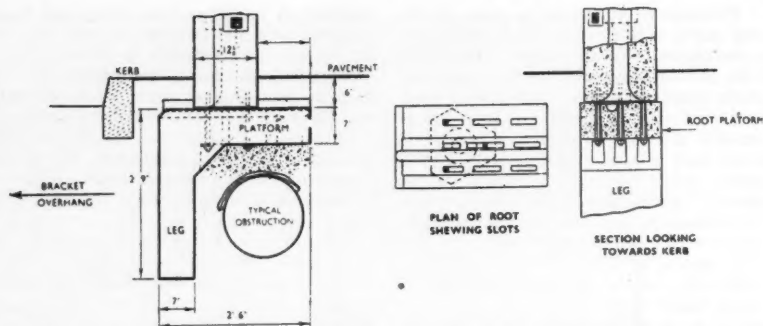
An adjustable crank root for use when site conditions do not allow spade roots to be used and avoiding the necessity to make special moulds. The position of the column on the platform can be varied; the leg of the platform can be towards the road or towards the pavement.
